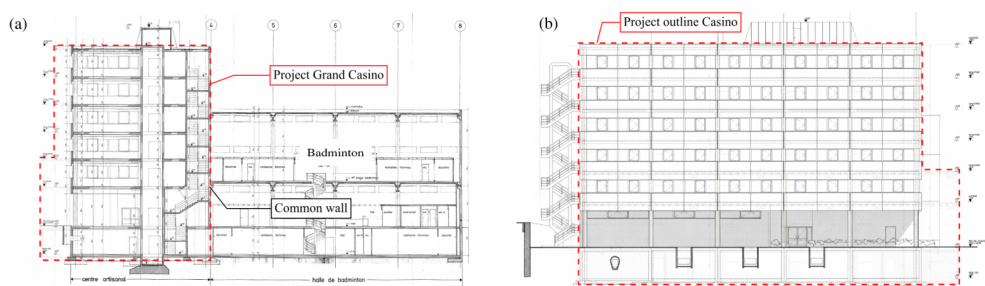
Existing structures and project outline of the Grand Casino Prilly: (a) section of existing buildings; and (b) elevation of centre artisanal
